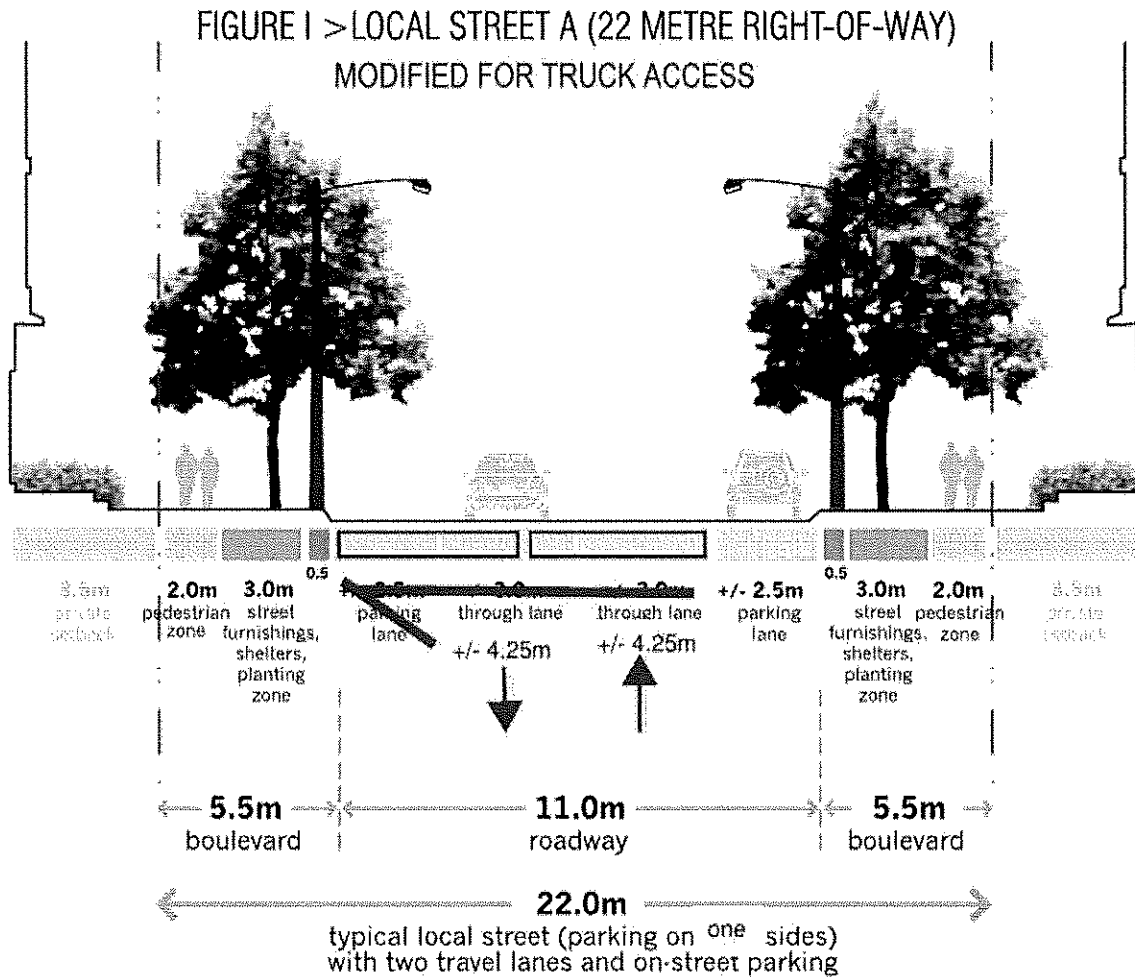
Proposed Street "C" Modified Local Street Cross-Section
